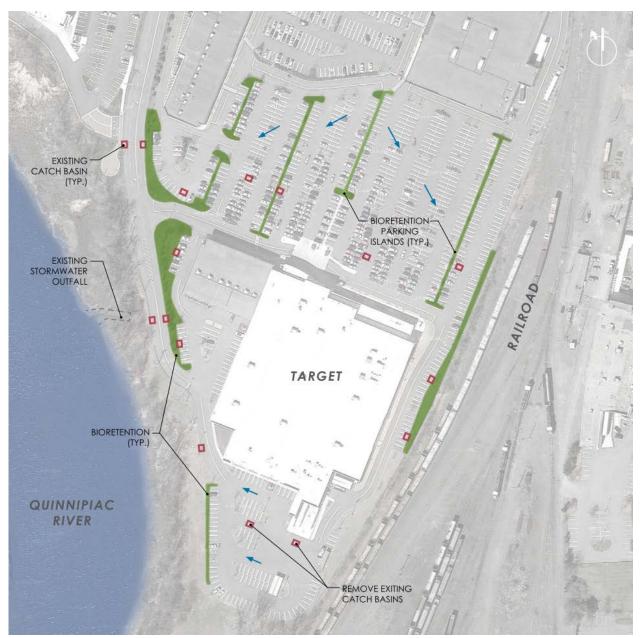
North Haven Shopping Mall Green Infrastructure Retrofit Concept
